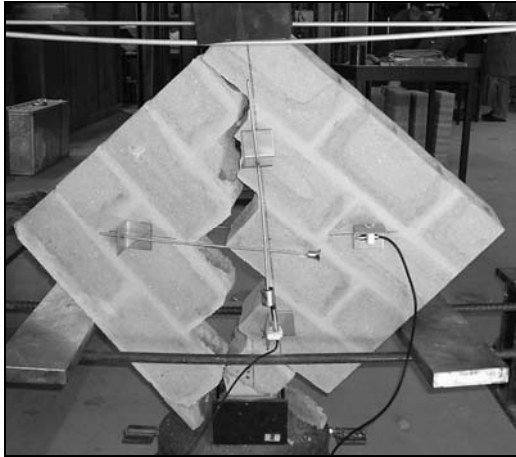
Cracking pattern on specimens built with 2C-units.
